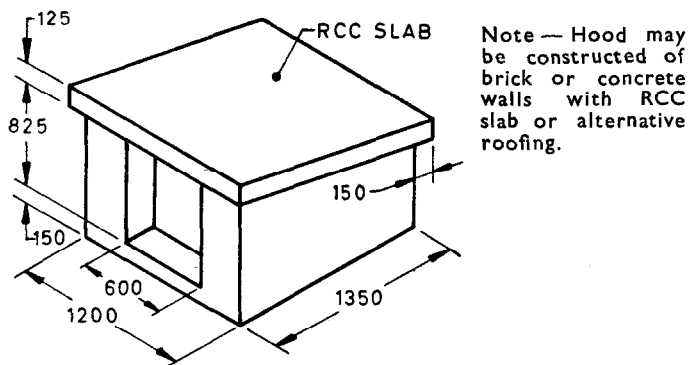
EXIT PASSAGE FROM UNDERGROUND SHELTERS
